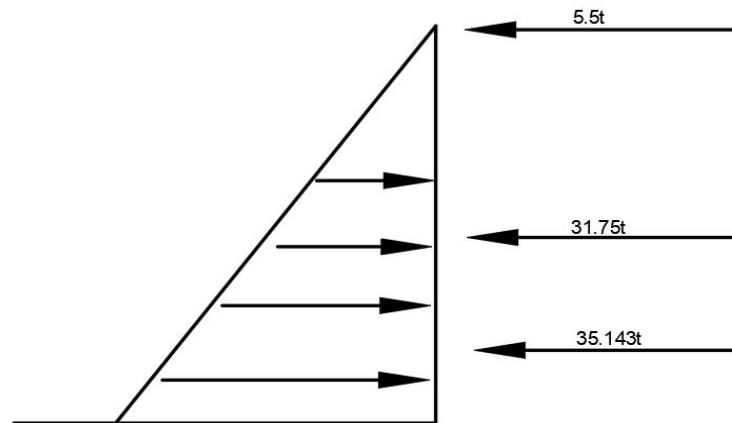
Hydrostatic Static Loading Diagram on Tank Wall
